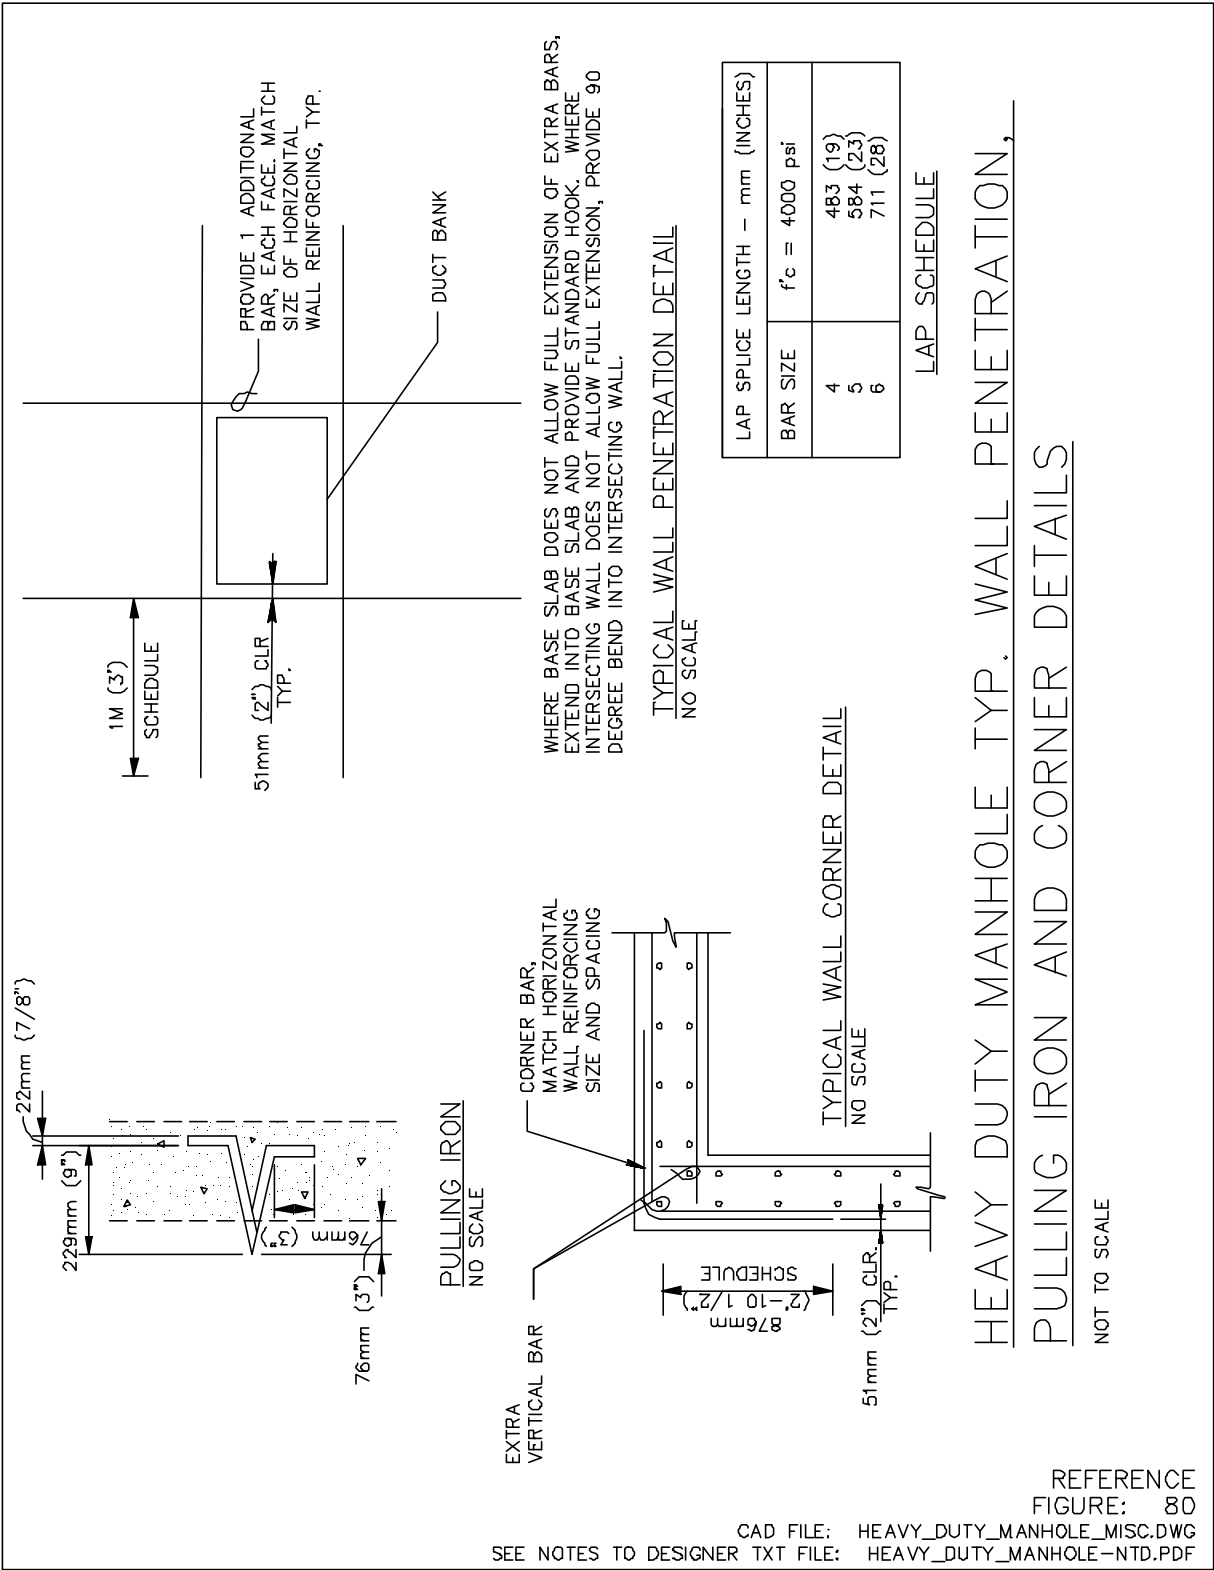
Heavy Duty Manhole – Typical Wall Penetration, Pulling Iron, & Corner Details
